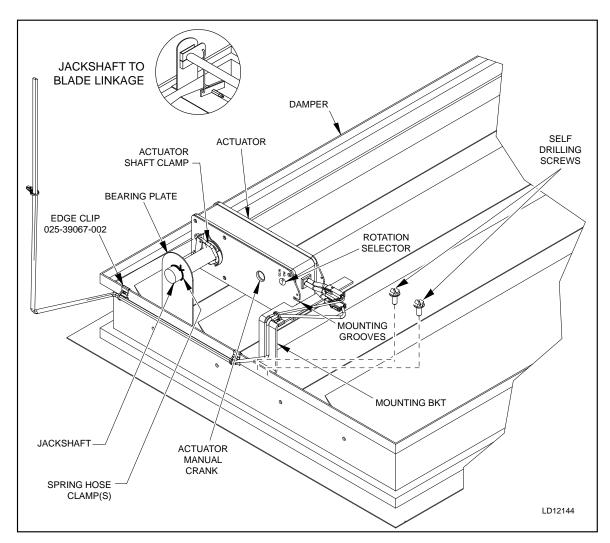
DIRECT COUPLED ON JACKSHAFT
